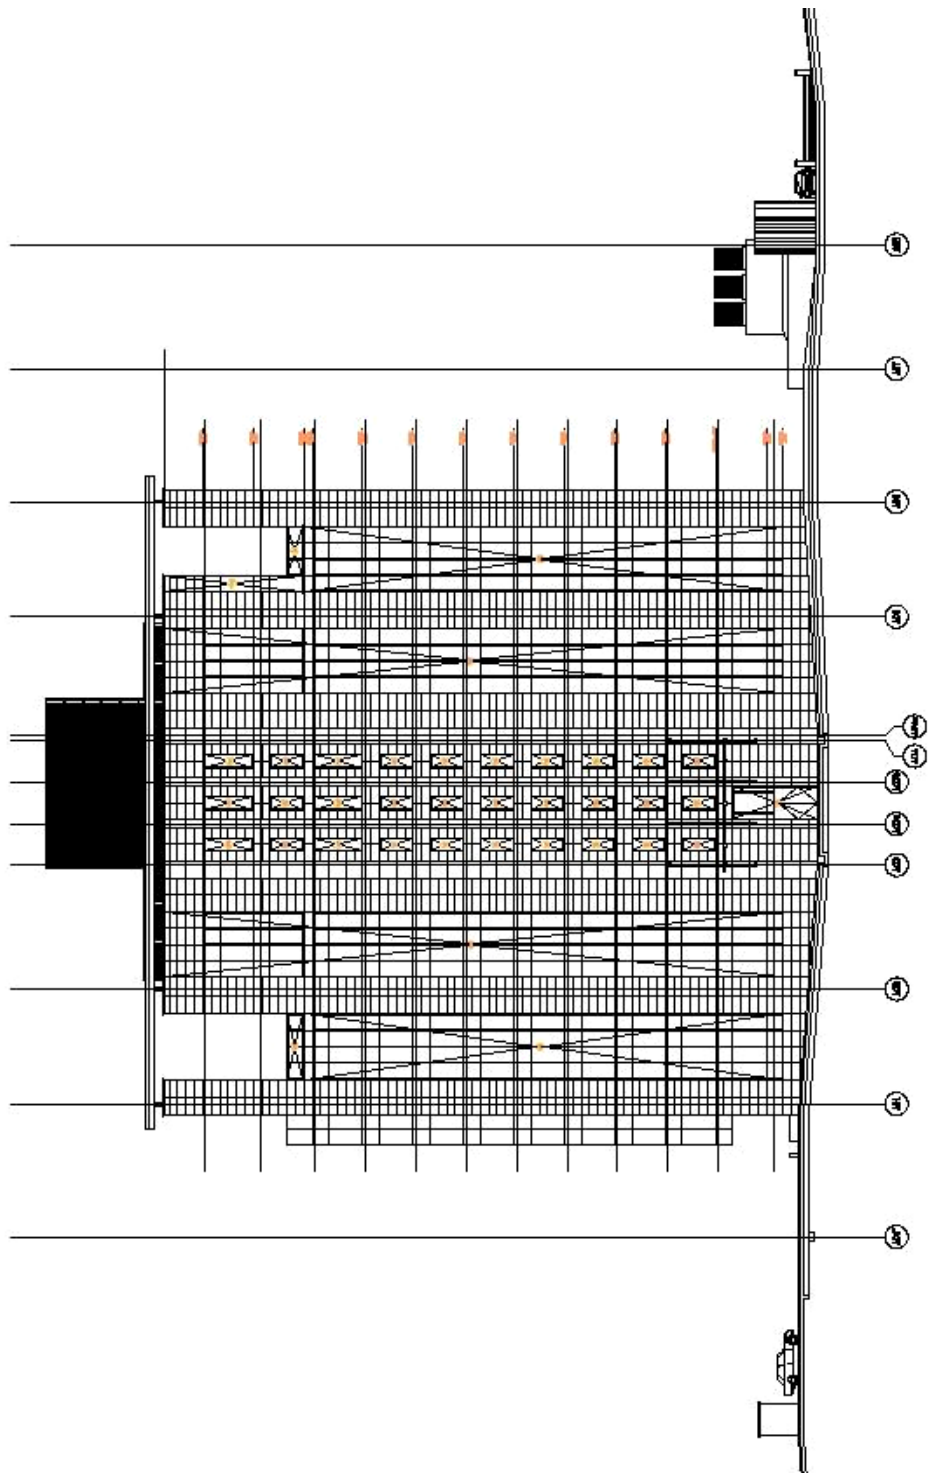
Birla Corporate Office, New Delhi: Side (North) Elevation
